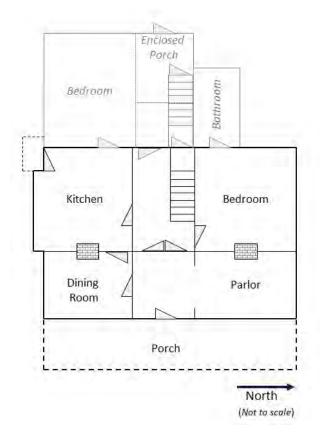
JS Wells House, first floor plan view. Note that greyed features represent the 1960s addition.
